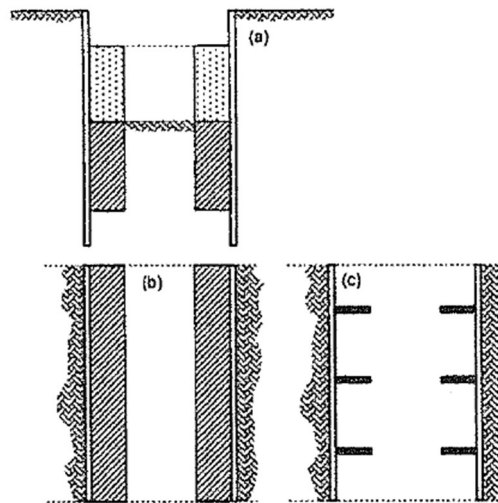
Schematic geometry of local interventions made in the soil downstream of walls (Callisto, 2011)
